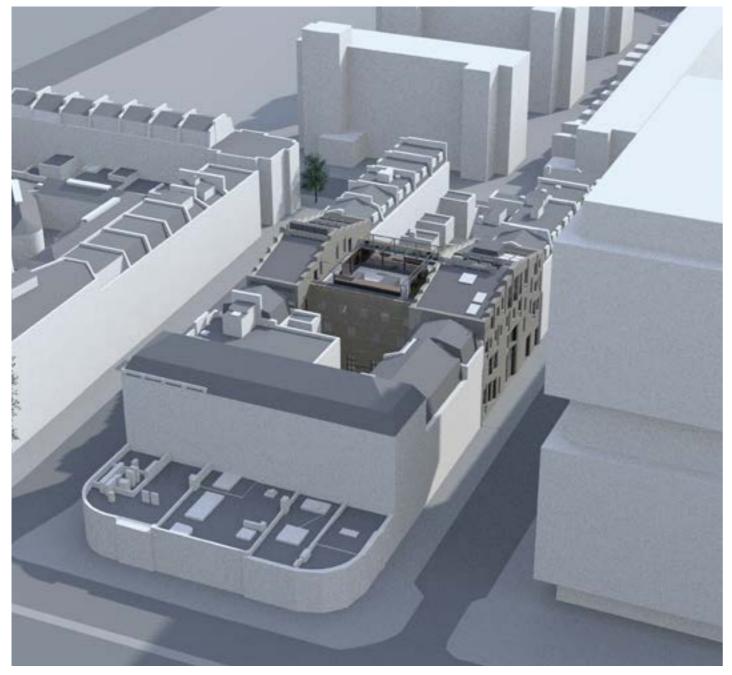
Proposed massing, view from Crestfield Street showing terraces along Euston Road and the under construction Belgrove house. Source: Matthew Lloyds Architects
